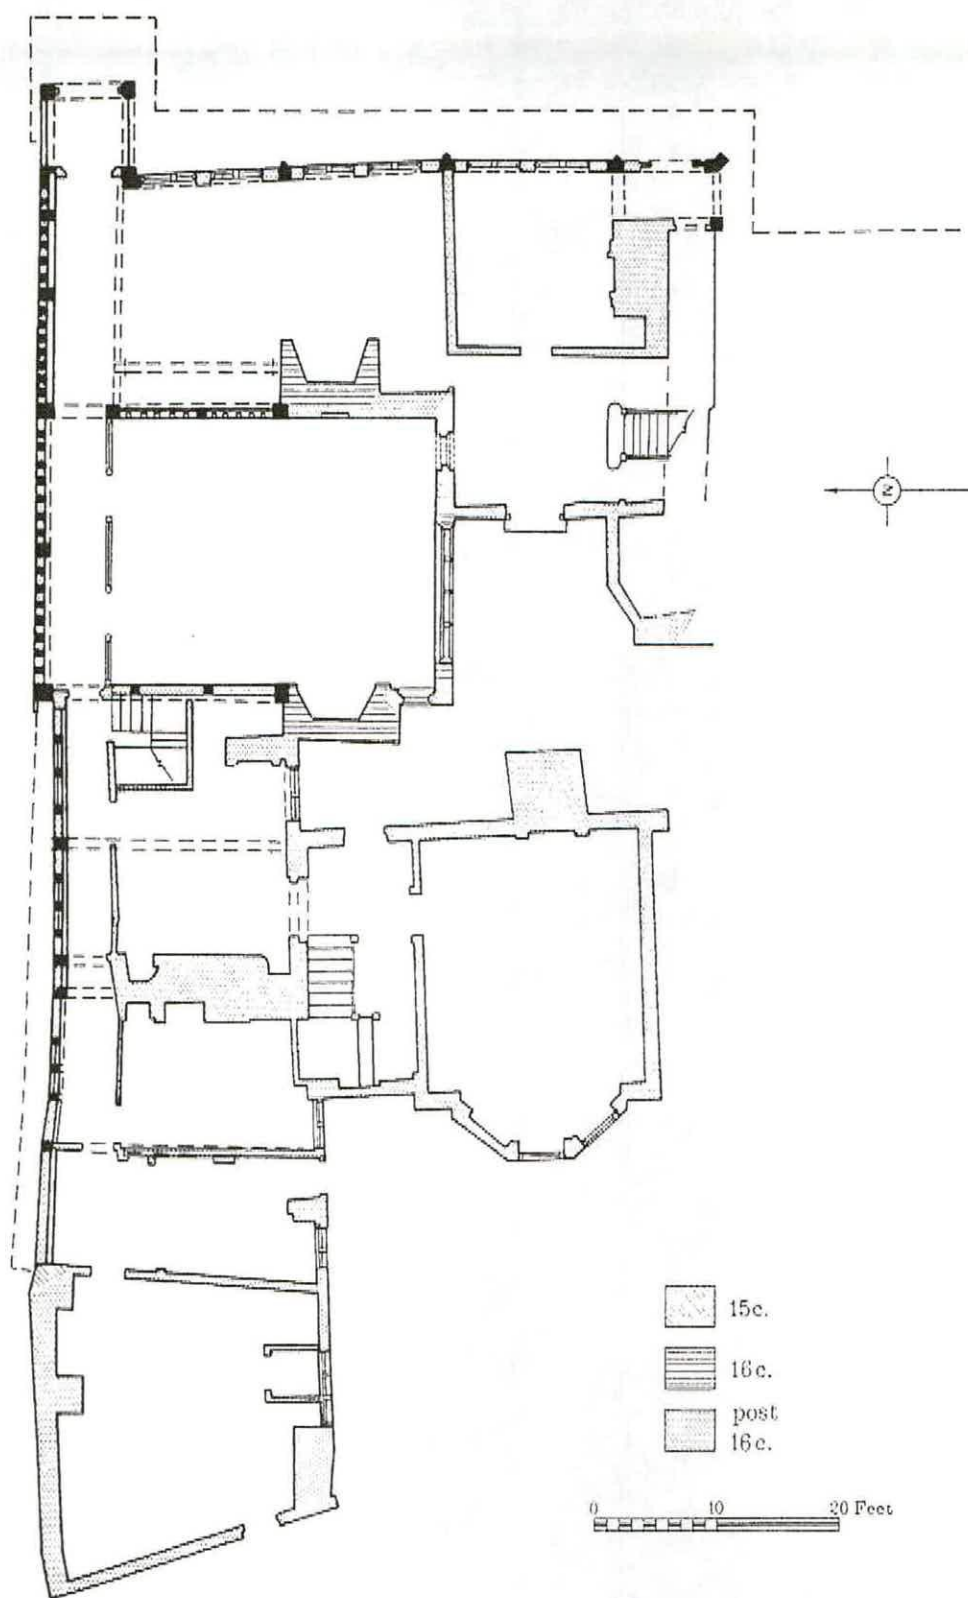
, the plan of the ground floor of Tudor House (Faulkner, 1975, fig. 31)
